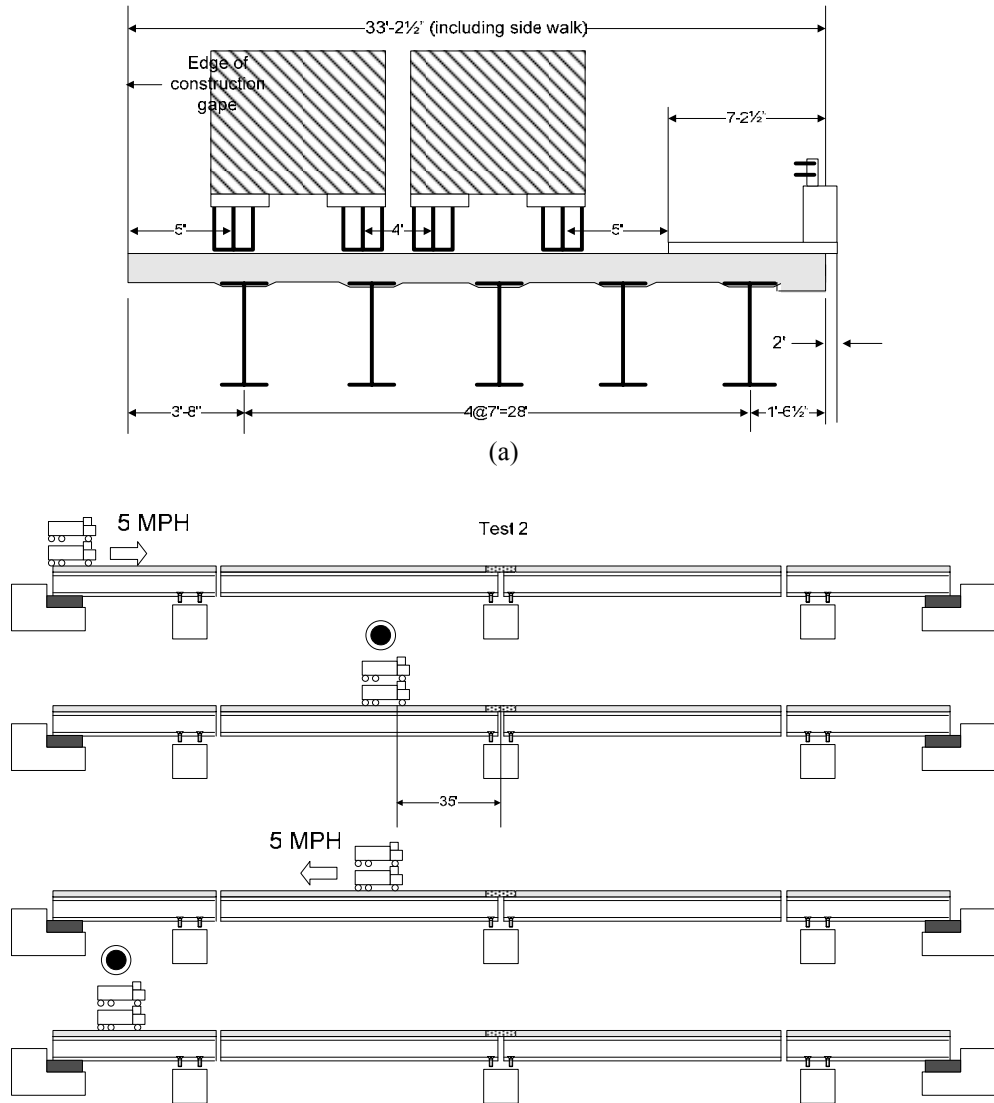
(a) Transverse truck location of Test #2; (b) Load plan for Test #2
